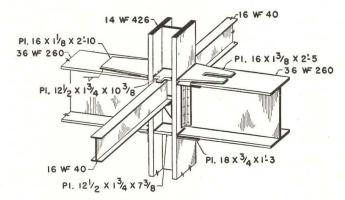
Framing details at third floor level of ten story addition to Register and Tribune Building. All holes are eliminated from main columns by fillet welding or plug welding erection brackets to web and erection anales to column flances.
